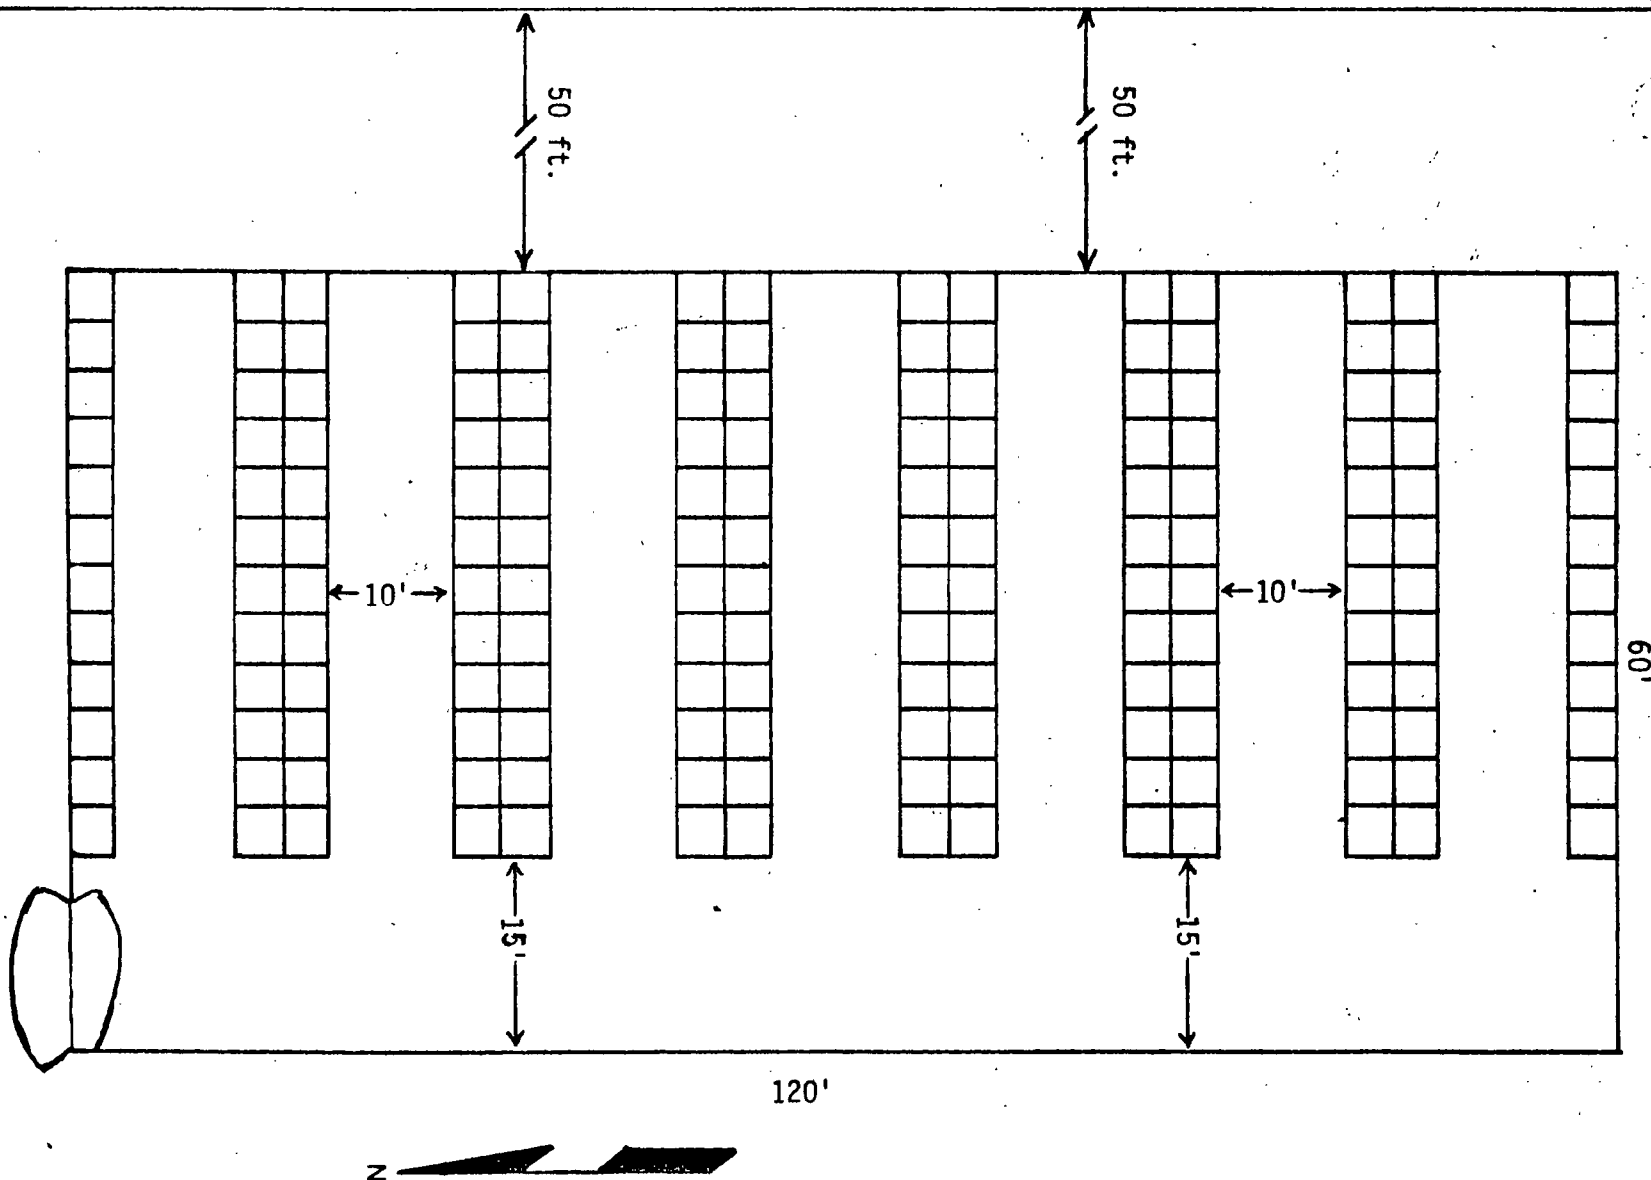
Arrangement of Drums Within the Drum Storage Building
